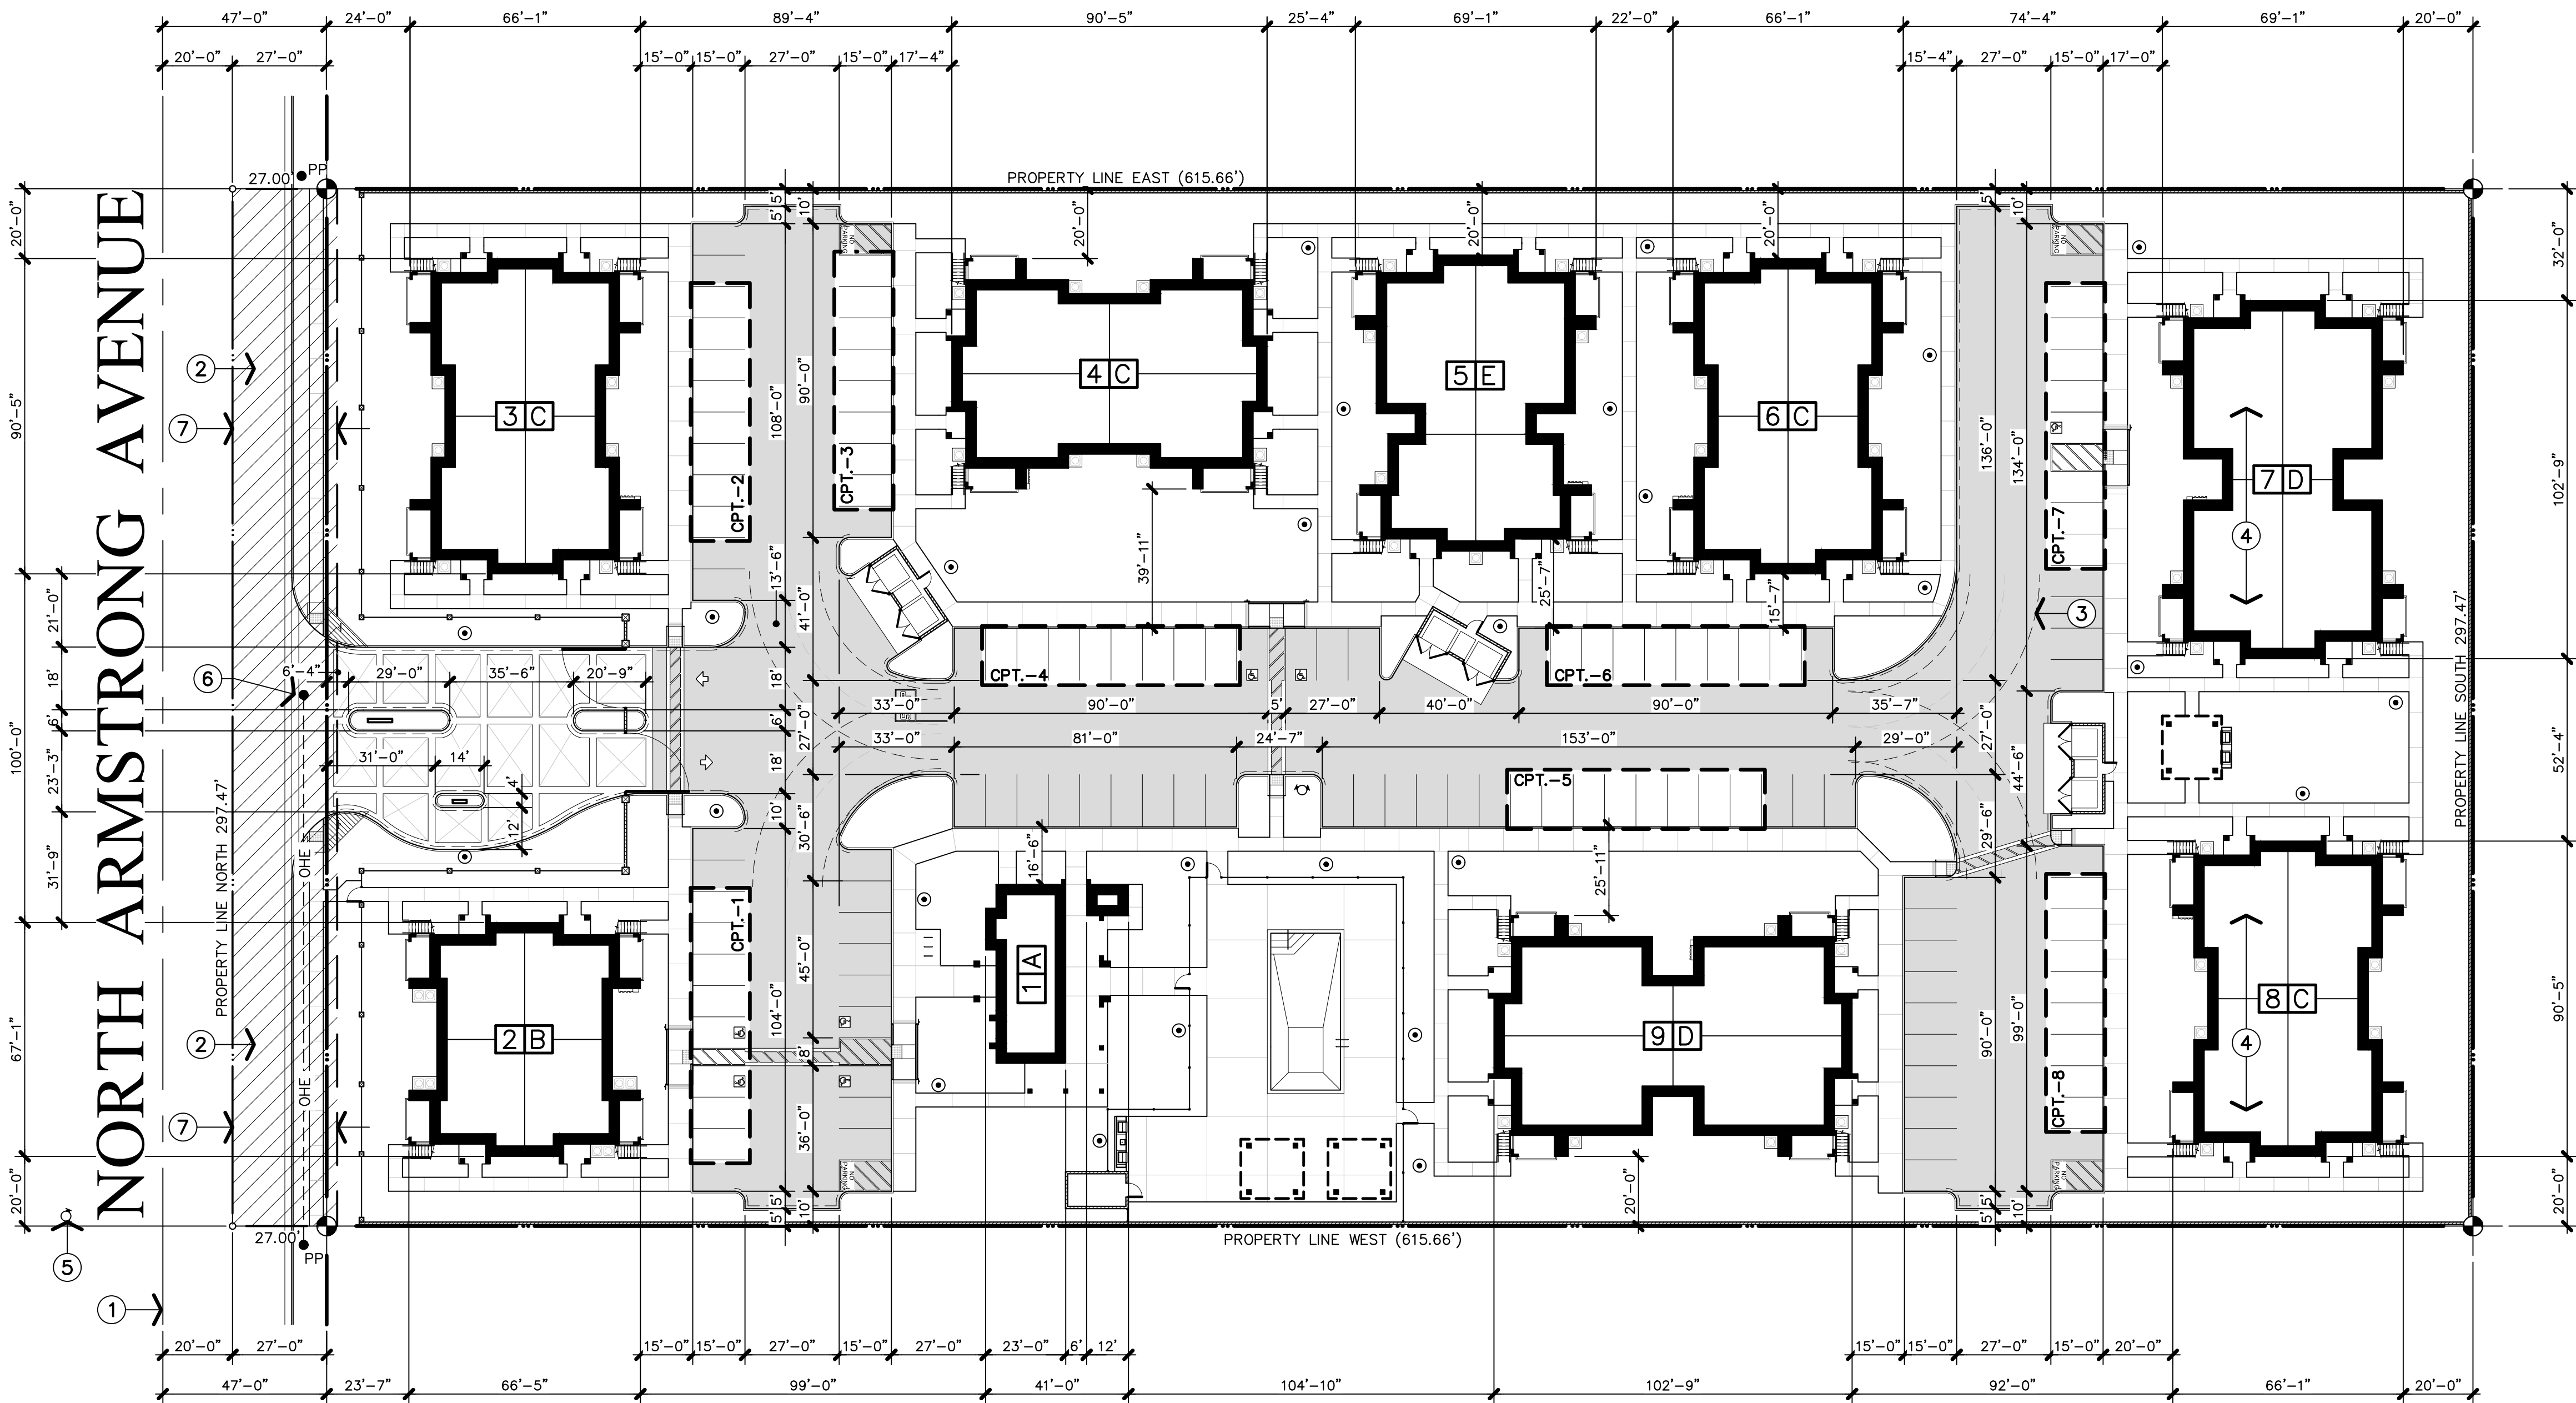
Exhibit H - Exhibits (Site Plan, Elevation Photos,
